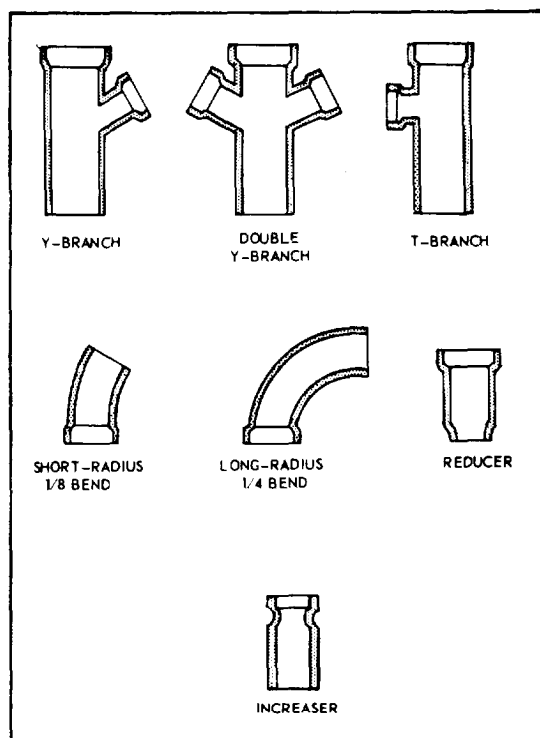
Cross section of vitrified clay or concrete pipe fittings.
